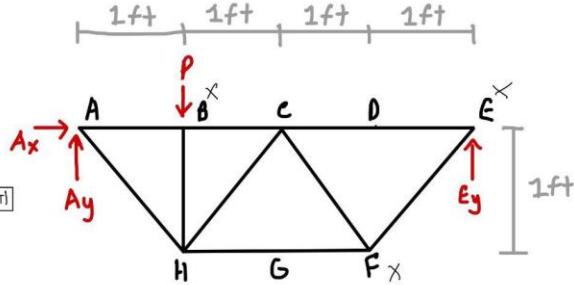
Methods of Joints Shown Work Towards Preliminary Truss Design
